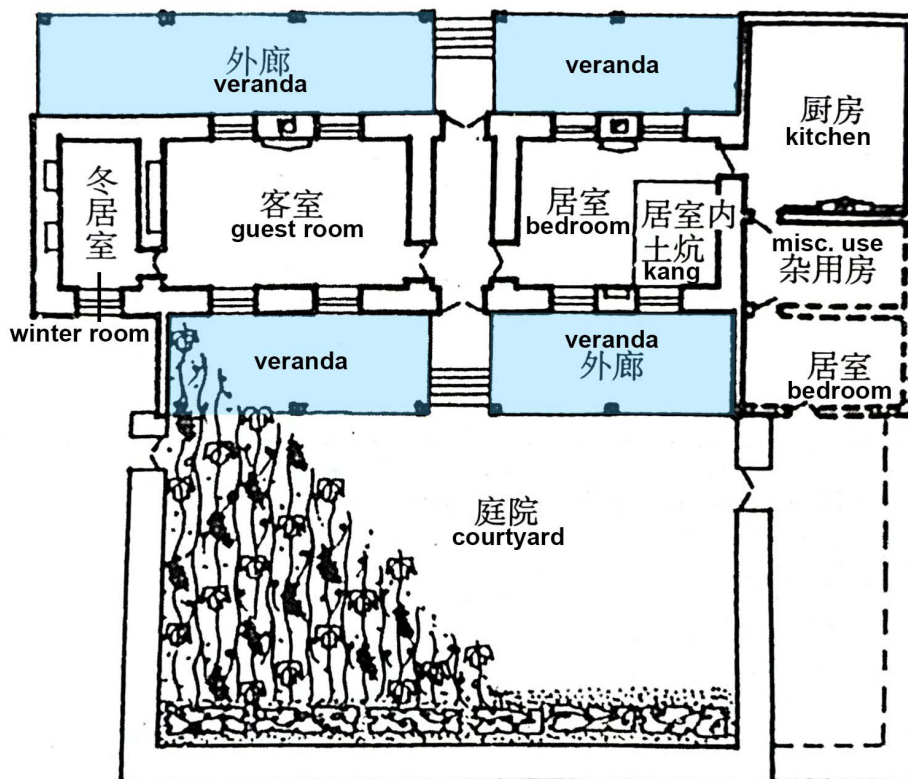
Plan of a double-sided veranda style house. Translated by author. Veranda space shaded blue.²⁶
